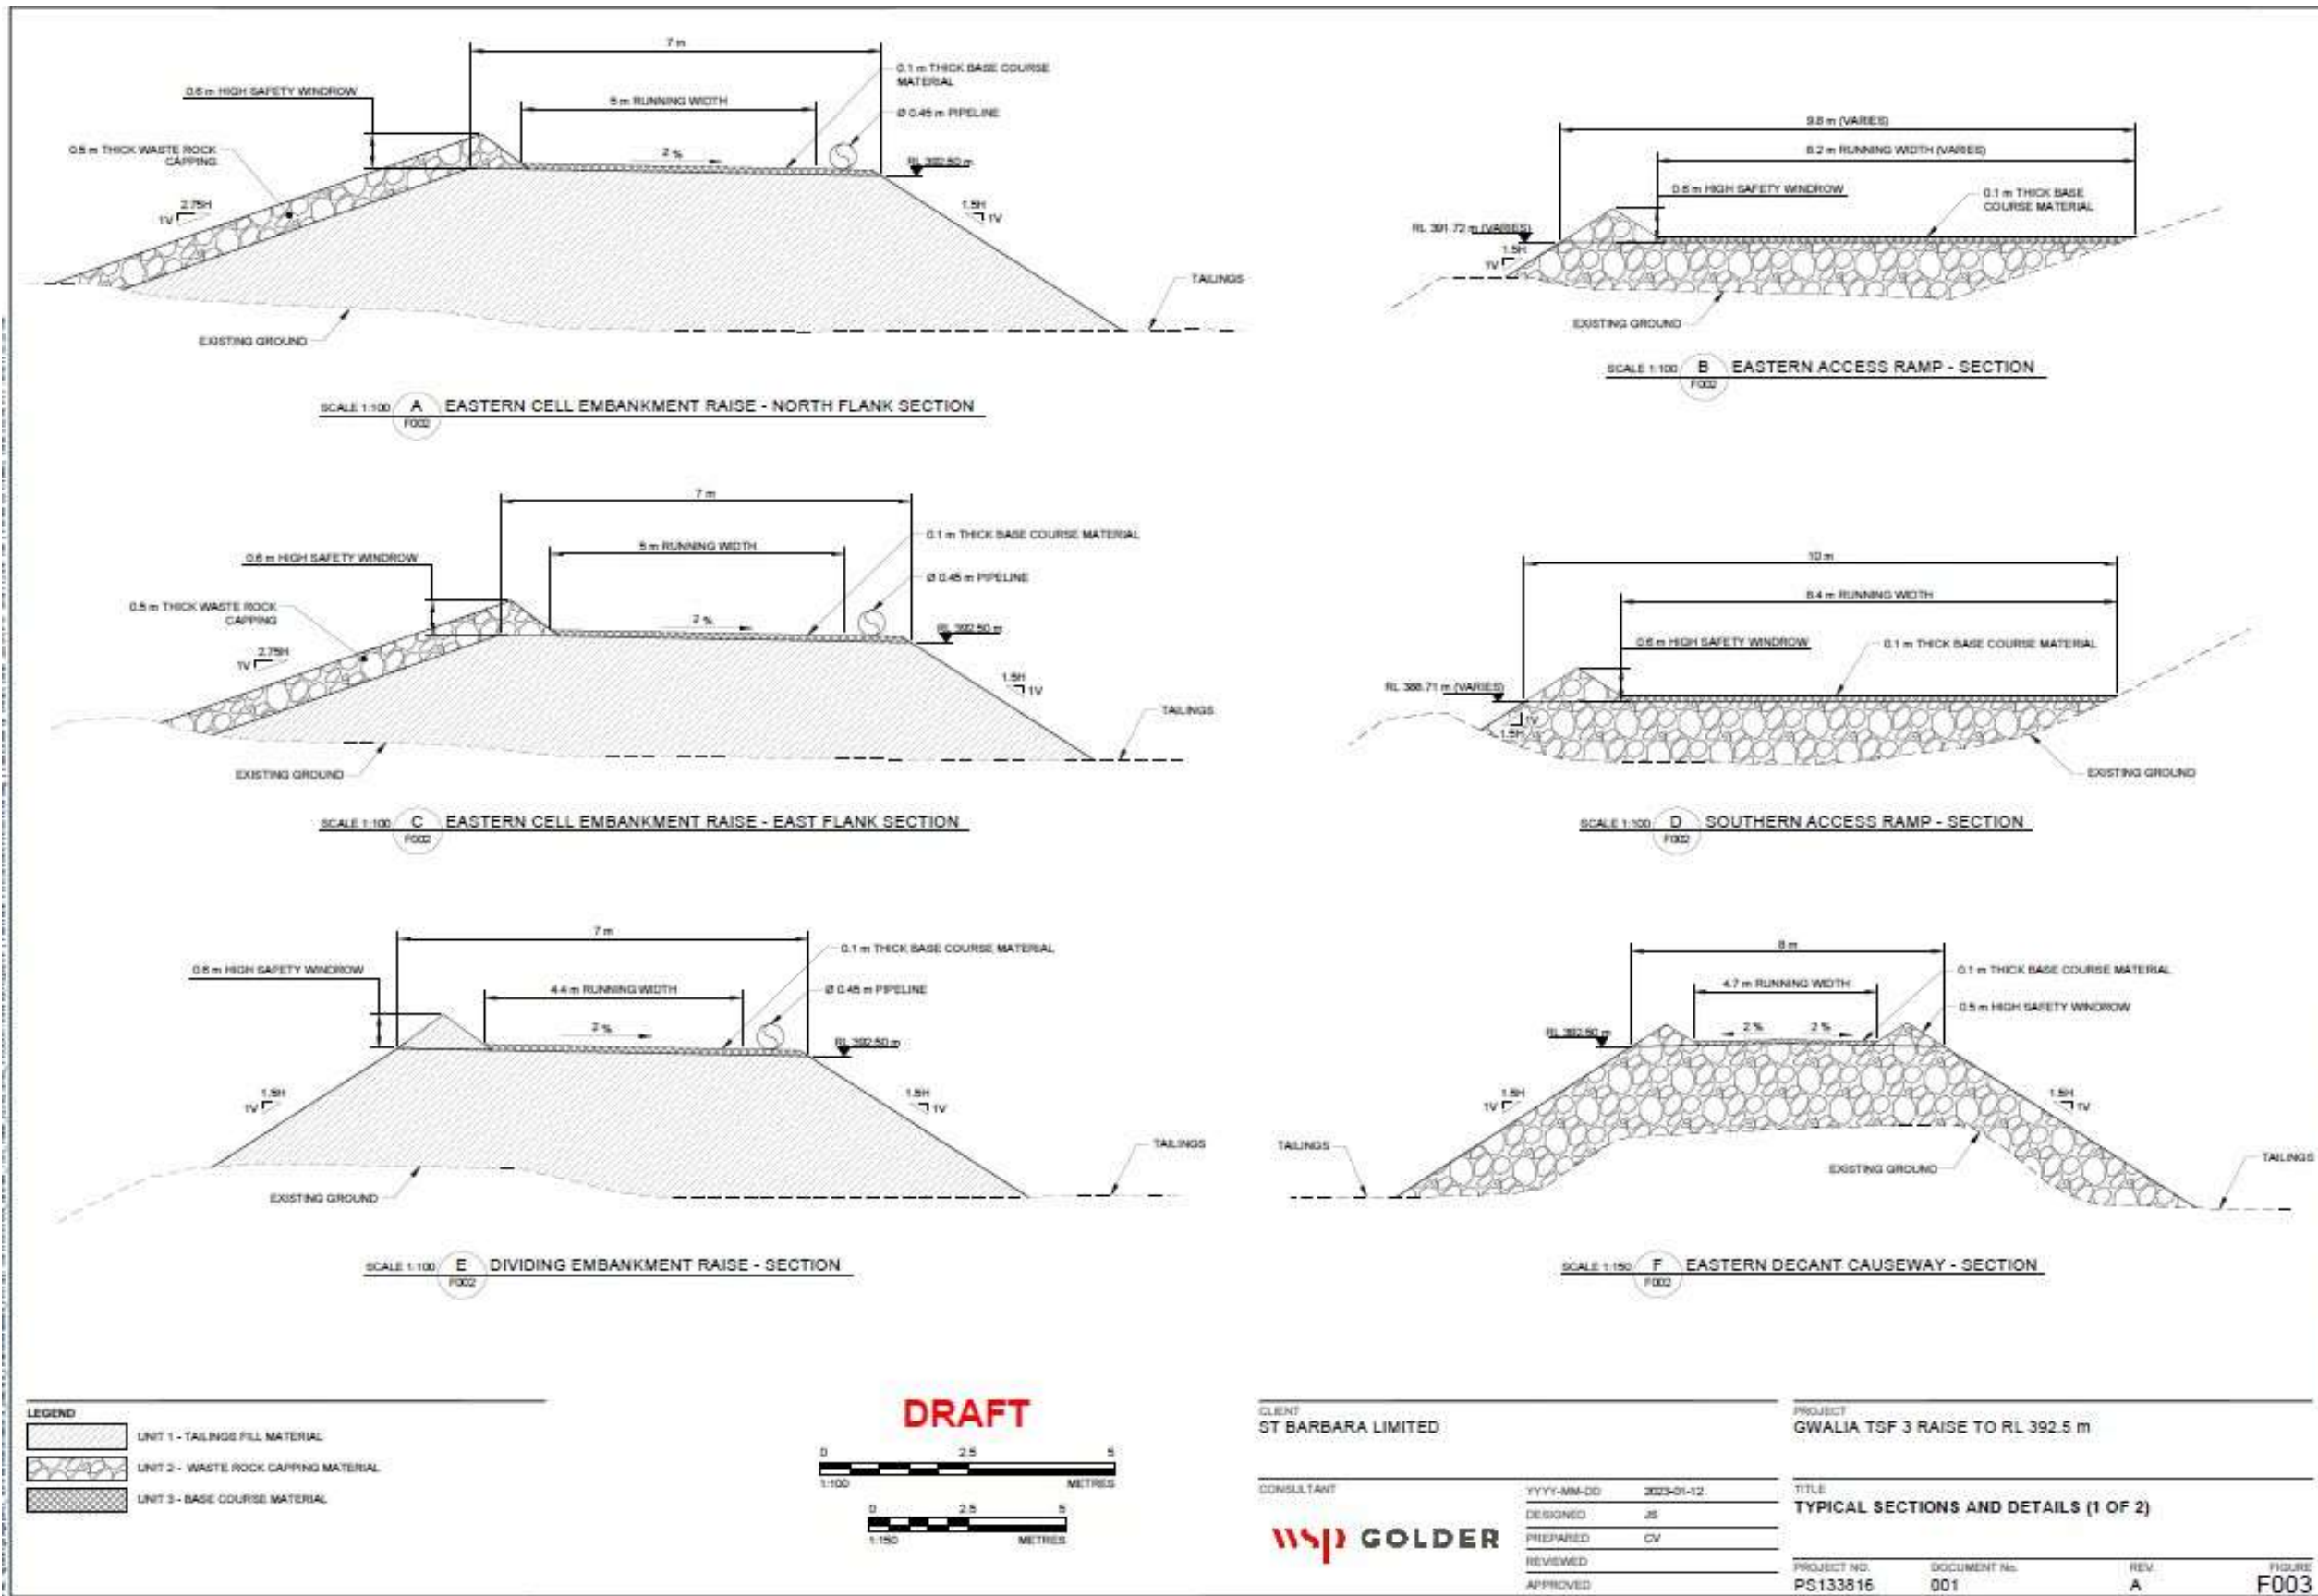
TSF 3 Raise to RL 392.5m – typical sections and details (1 of 2)
